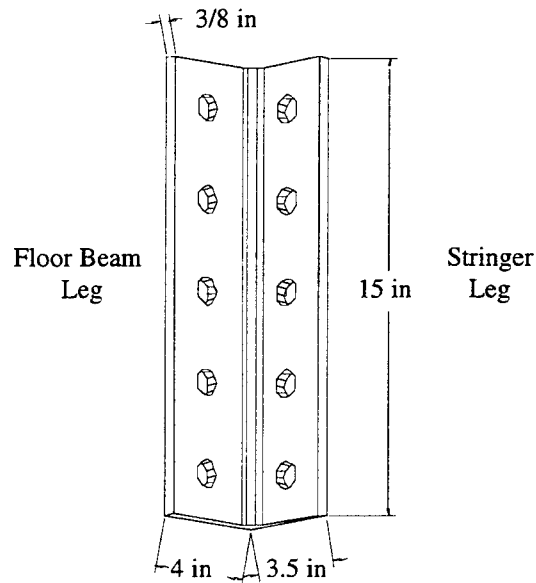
Clip angle used in the stringer to floor beam assemblies on the Winchester Bridge.
